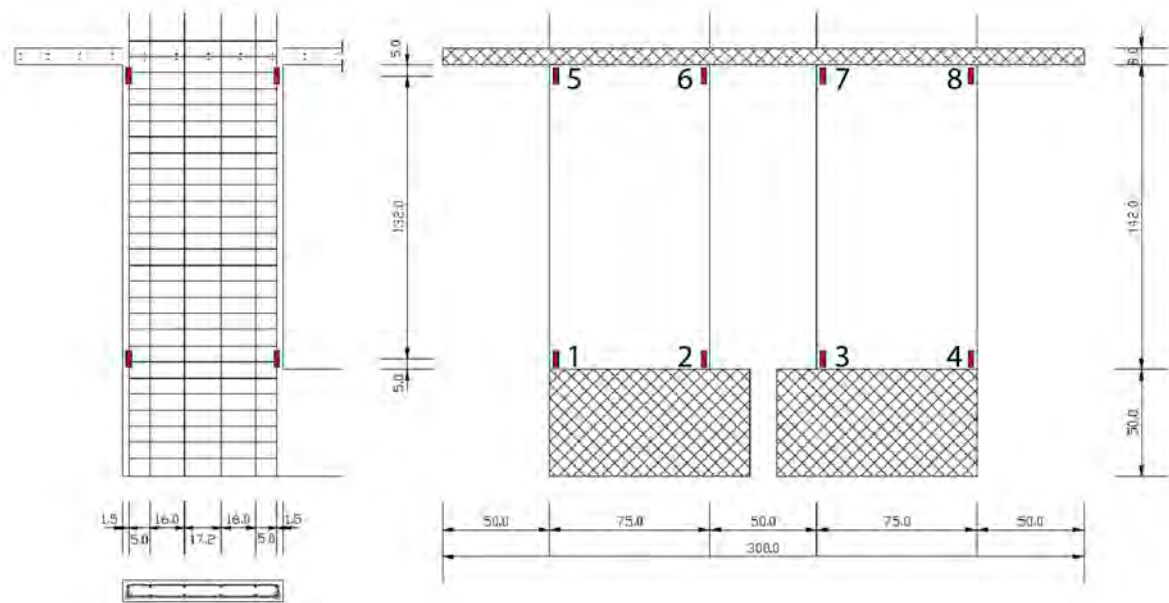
Strain gauges – 1st floor walls (on longitudinal bars)
